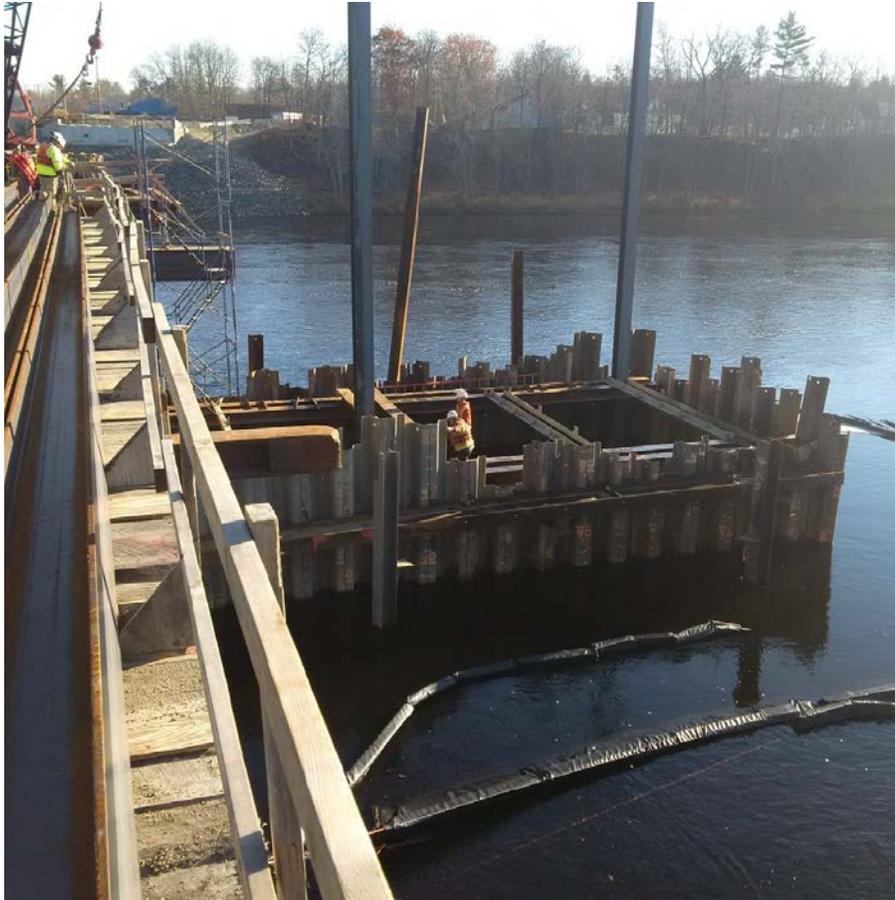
Constructing a spread footing pier requires use of a four-sided cofferdam.
